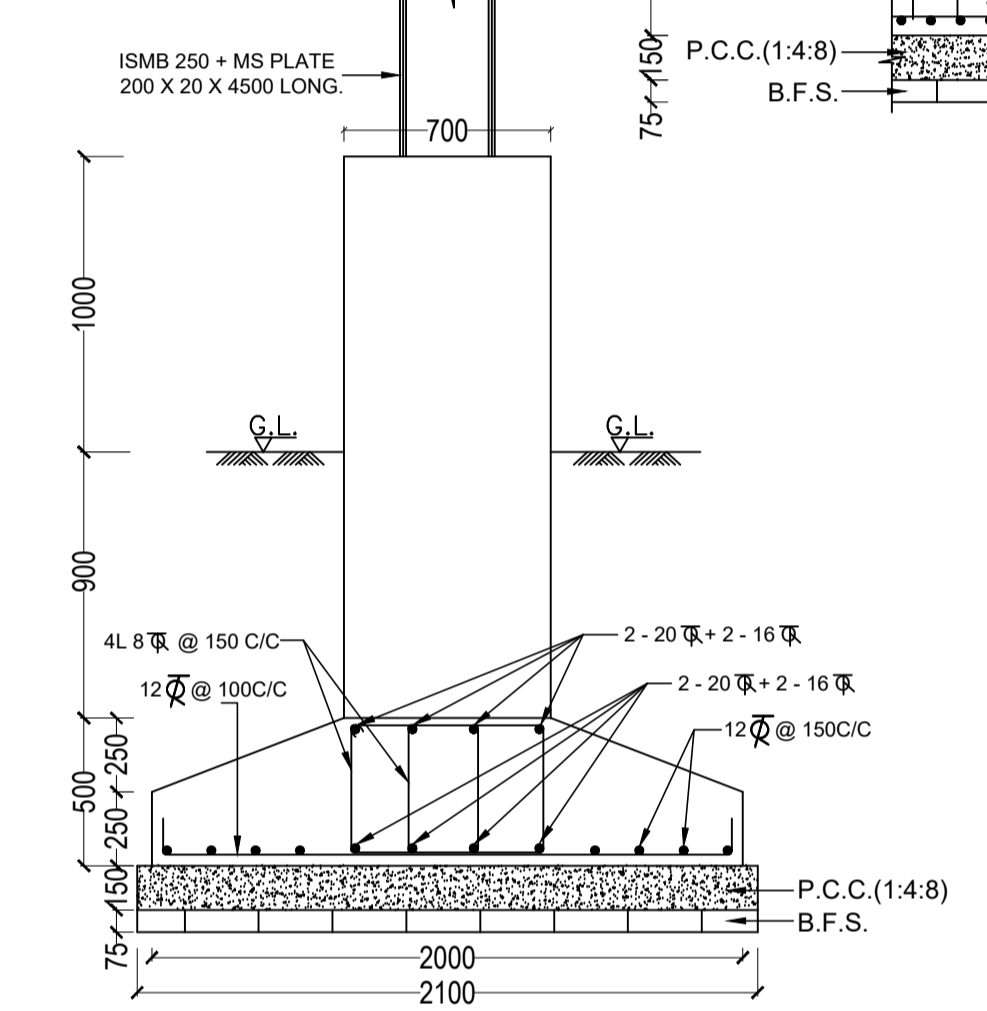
DETAILS OF MS BASE PLATE CONNECTION FOR ISMB 250
